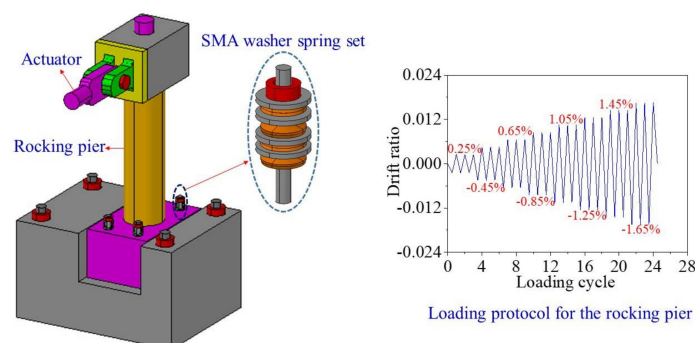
Configuration of a rocking pier specimen and loading protocol.
